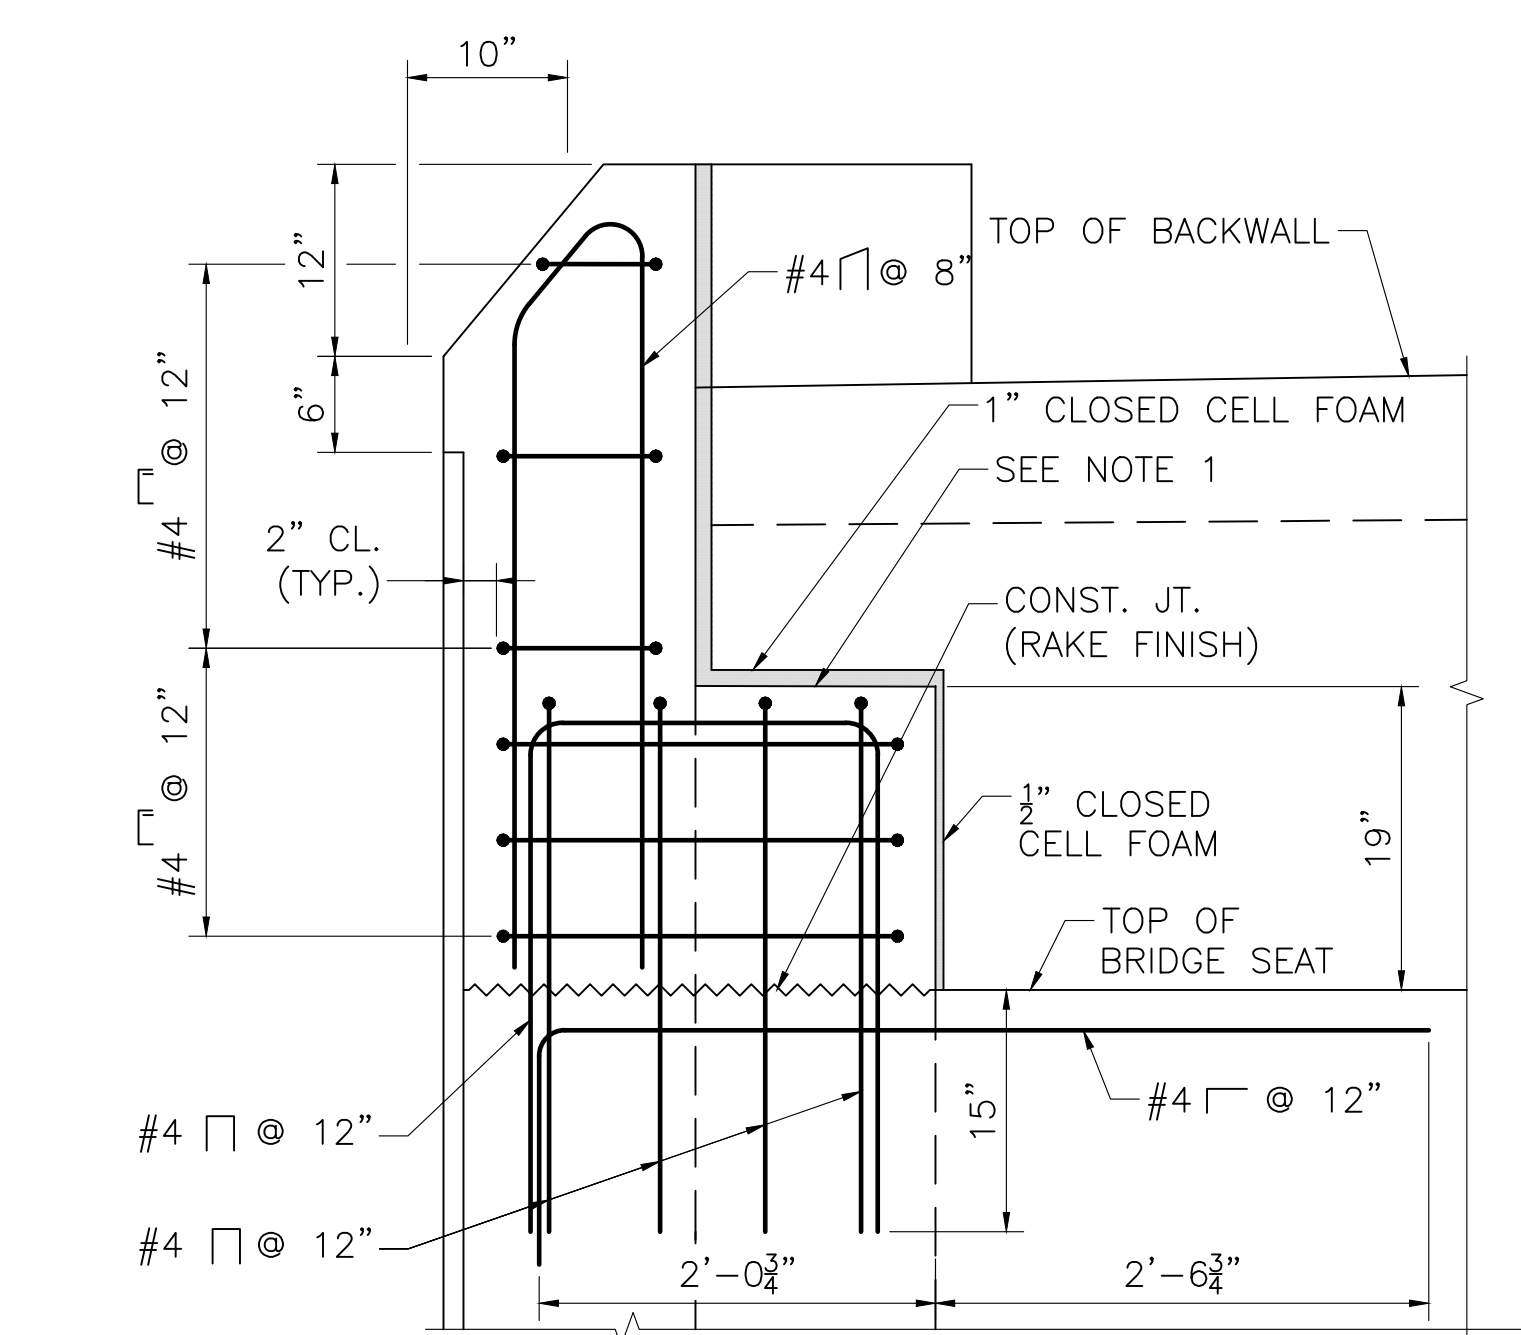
DETAILS AT ABUTMENT UTILITY BAY AT SIDEWALK SECTION
